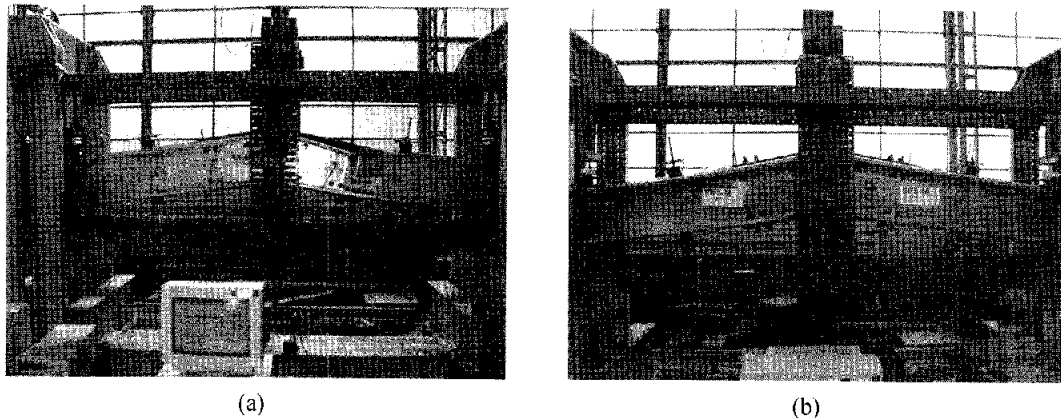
Failure of ridge specimens RIS-M (a) and RIP-FB-M (b).
